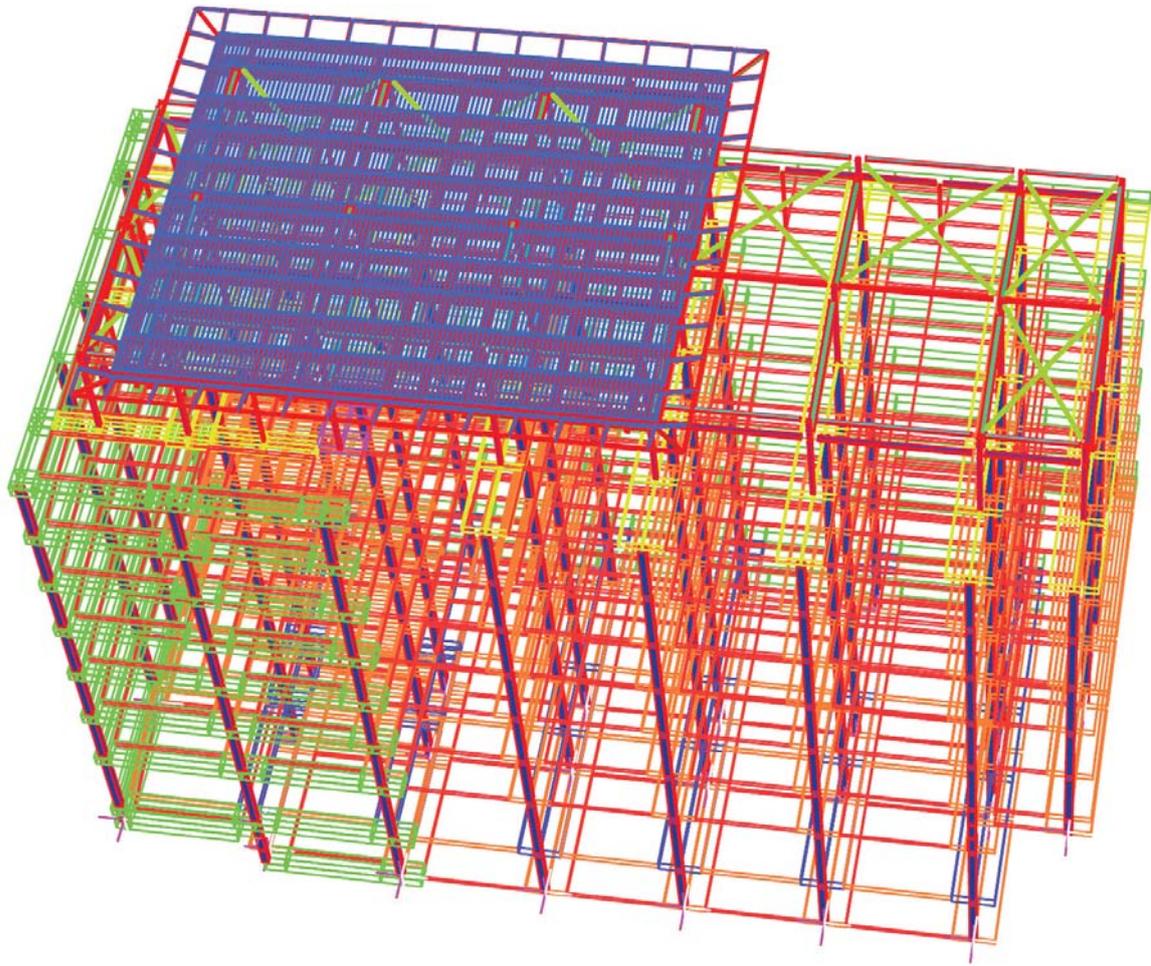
Section of Model indicating relation of helipad to sensitive areas at Level 4 & Level 5 (based on Structural drawing and steelwork drawing ST-DWG-KB12-2012200 Rev 9)
